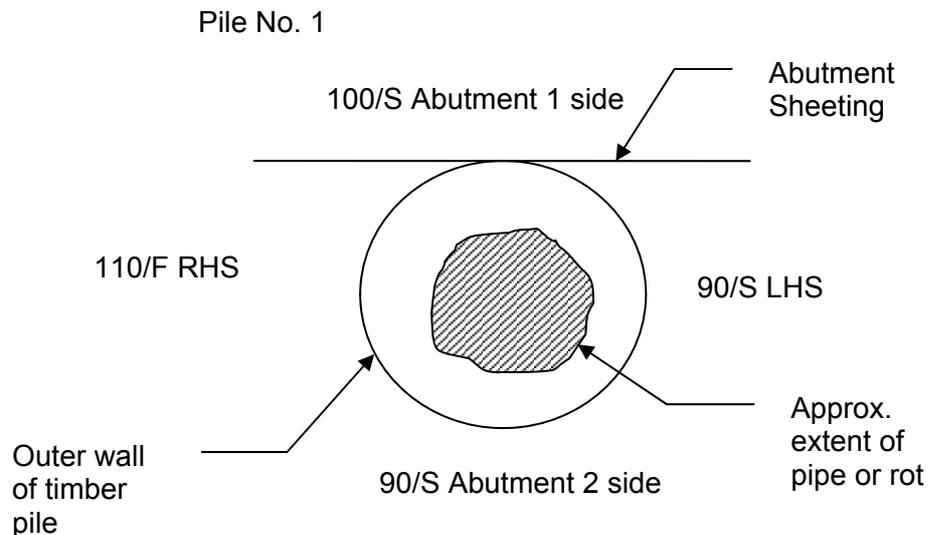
ABUTMENT PILE ROT ZONE EXAMPLE
